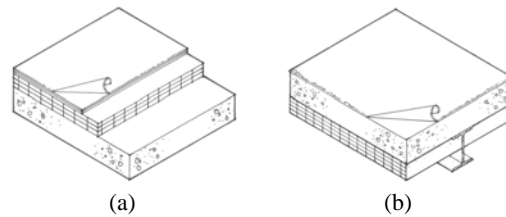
(EN11) Floors, mass—any floor with a heat capacity exceeding 7 Btu/ft²·°F.
